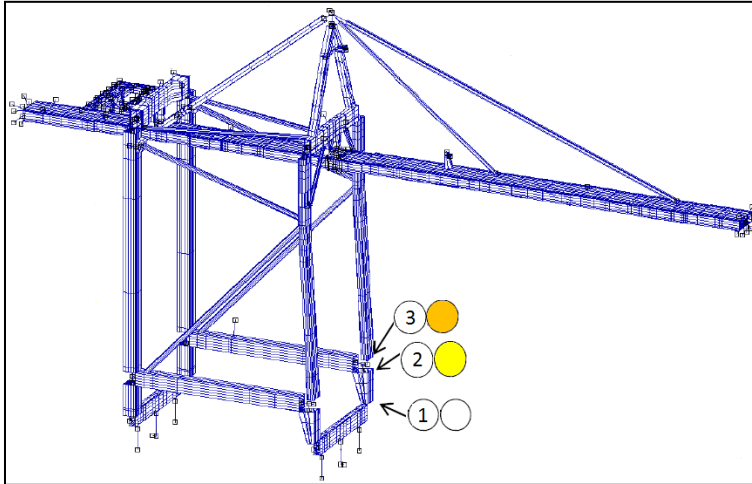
Connection between the sill beam and lower leg (no. 1); the lower leg and cross girder (no. 2); the cross girder and the long leg (no. 3)
